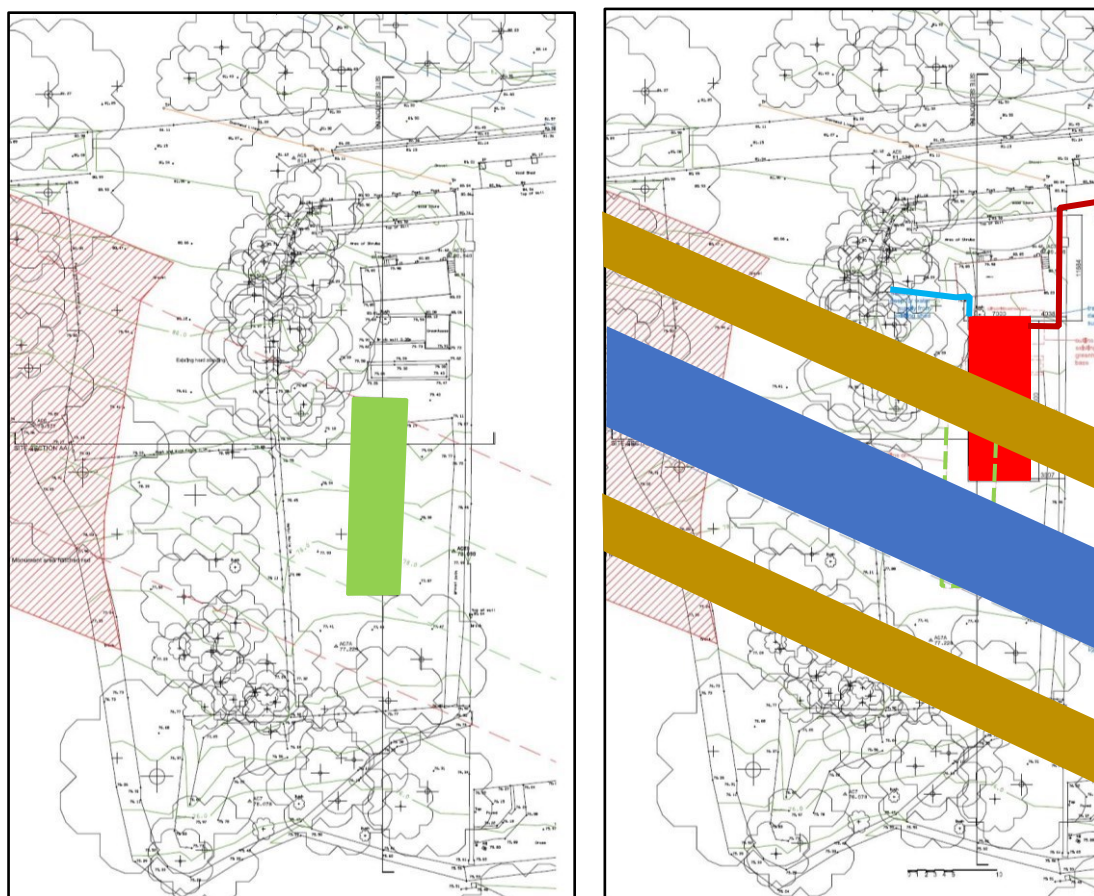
Drawings EO1 (Revision D) and PO1 (Revision D) by Doonan Architects showing (left) the existing site with polytunnel in green immediately to the west of the walled garden at Chesters, and (to the right) the proposed storage shed in red with the outline of the polytunnel in dashed green. Trench for electricity cable in brown; Trench for water in blue. Projected course of Vallum Ditch in green tone and north and south mounds in brown tone. Scheduled area to west hatched in red.
